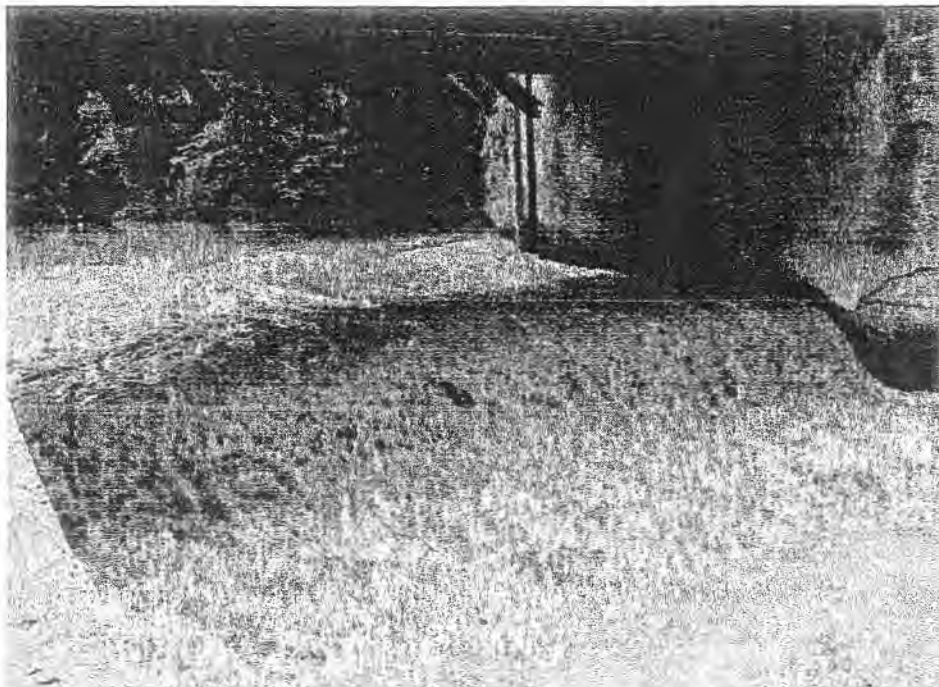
Downstream side of the Coloso dam. Drop during lower flows (photo condition) approximately 2 meters including a lower step not shown in the photo. Note that the vertical sidewalls have a wetted zone.
